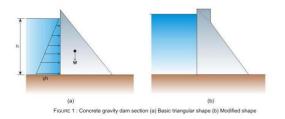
Concrete gravity dam section (a)Basic triangular shape(b)Modified shape
